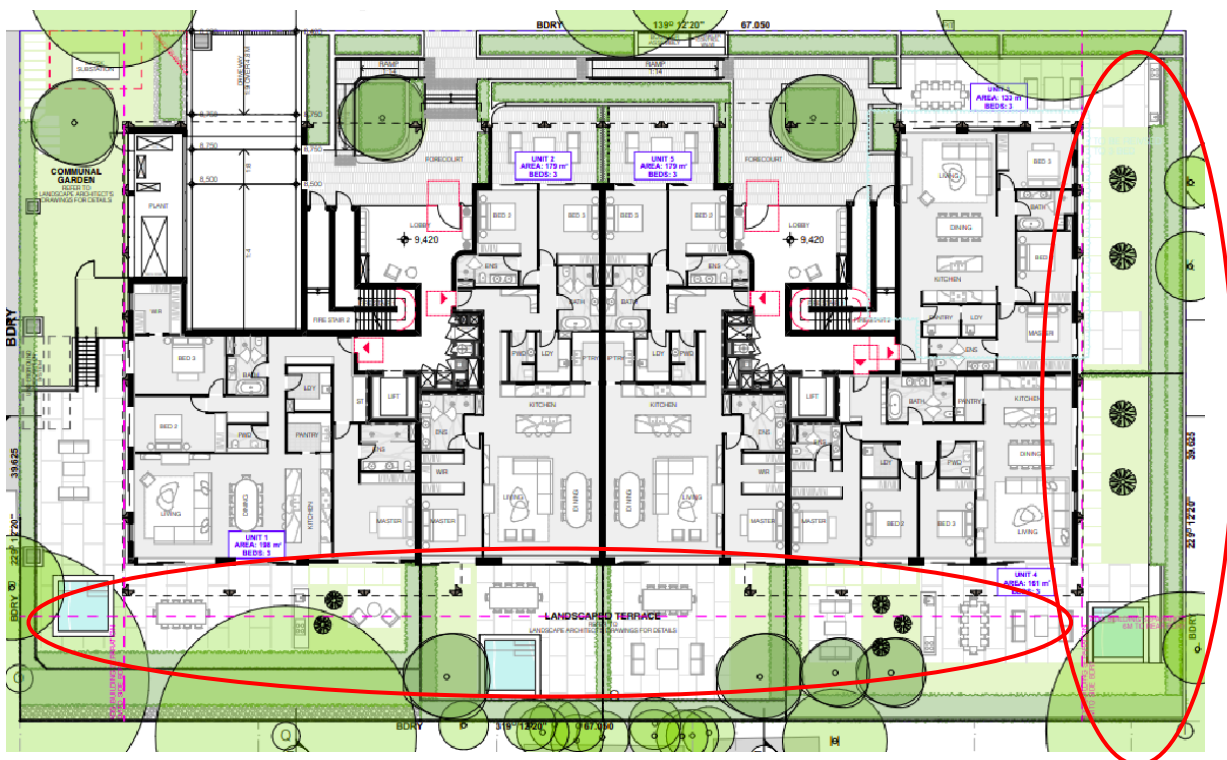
Extract of Ground Floor, non-compliance highlighted in red (Source: Architectural Plans - SSD-86017721)
